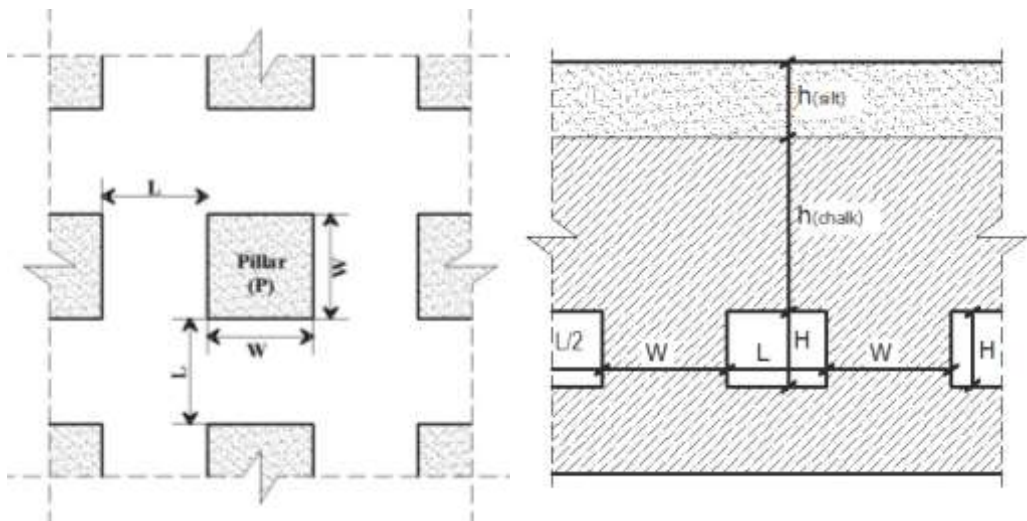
Top view and vertical section of the room-and-pillar underground structures.
